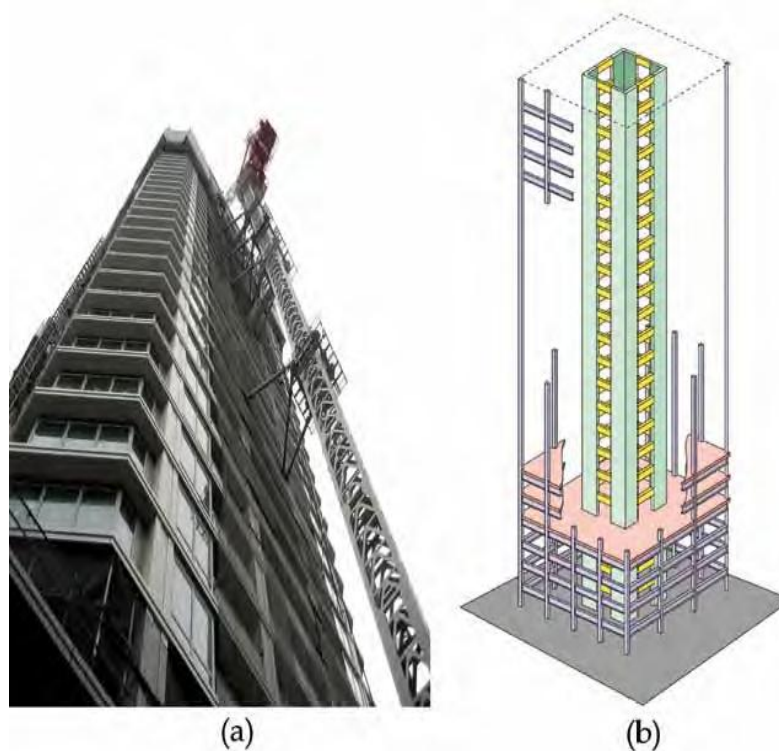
(a) The Nabeaure Tower in Yokohoma, Japan building with pre-cast coupling beams and (b) Schematics view showing coupling beams (in yellow) on each floor (Maruta et al. 2005)
